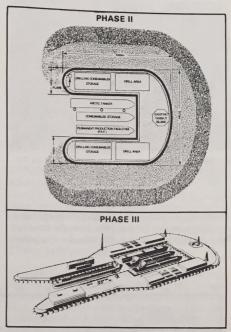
The Tarsiut exploration island could also be enlarged to an olfshore production and loading facility. This facility includes oil storage, processing and loading facilities as well as the drilling systems. The slot in the island provides protection for the storage and production systems and for tankers which would load at the island. The ice thickness inside the island is controlled by waste heat from the production process.
